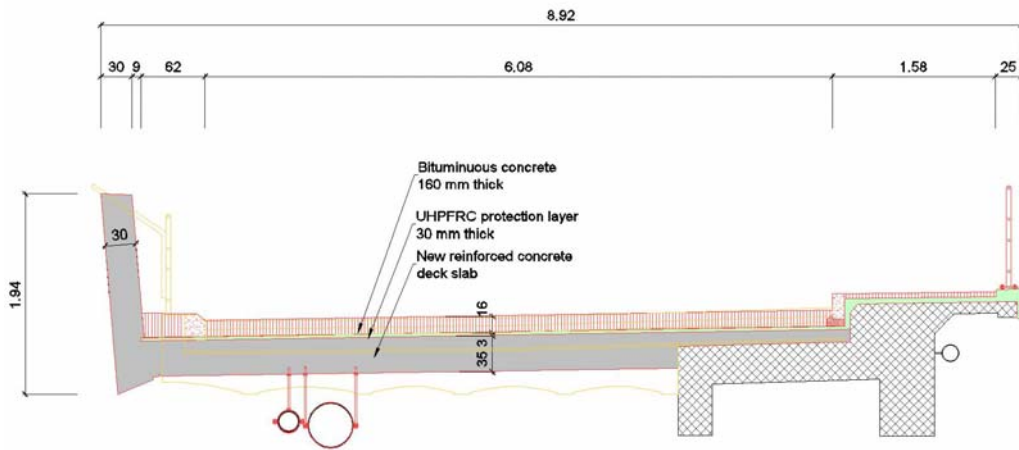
Cross-section of maintained sidewalk slab with the reinforced-UHPFRC layer
